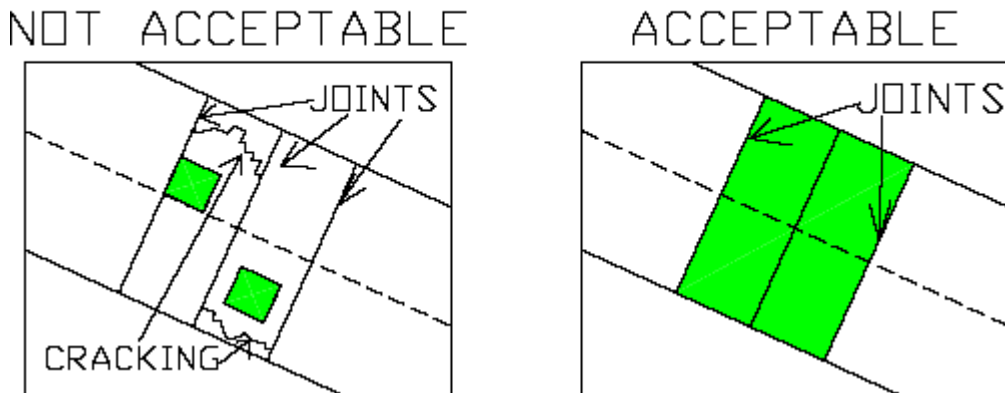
Example 4: In concrete pavements, remove sections to existing joints.
